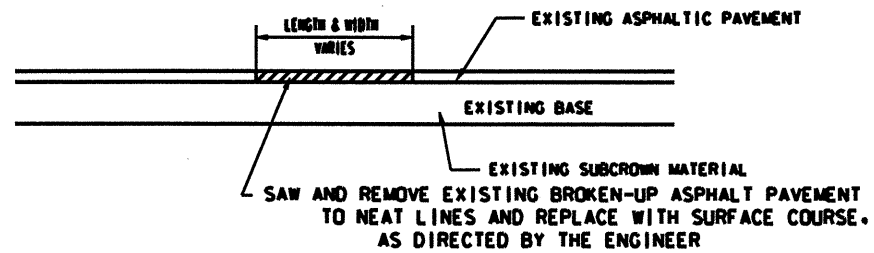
DETAILS OF REPAIRING EXISTING PAVEMENT PRIOR TO RESURFACING FOR FULL DEPTH AND MILLING
